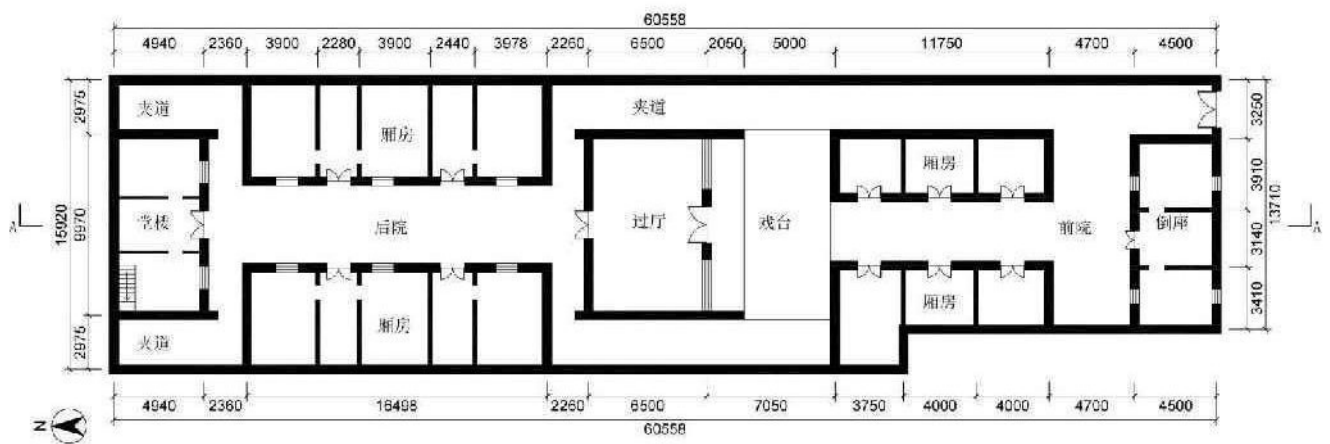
Courtyard floor plan. Source: Drawn by the author.
